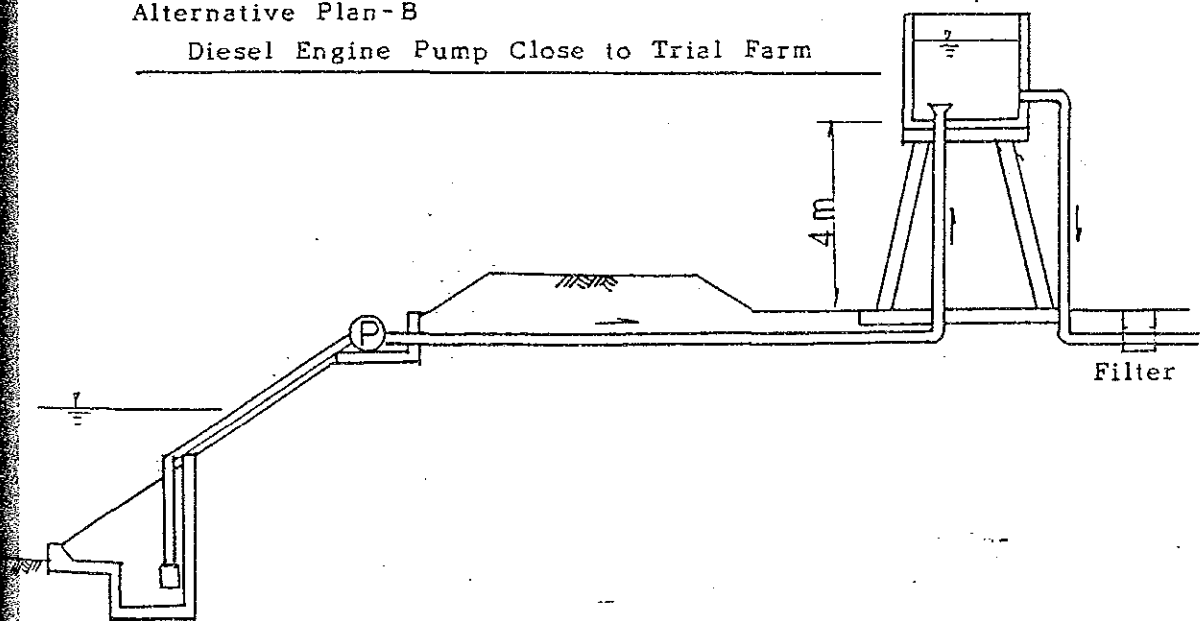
ALTERNATIVE PLAN OF PUMPING SYSTEM
